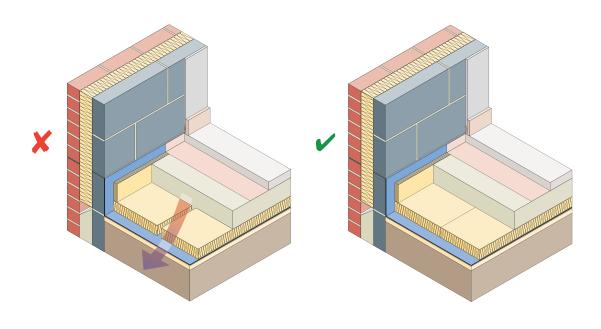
Ground floor in-situ concrete slab. Ensure insulation boards are tightly butted together to avoid heat loss to ground.the air barrier should be turned up at the perimeter wall and overlapped by the plaster finish.
